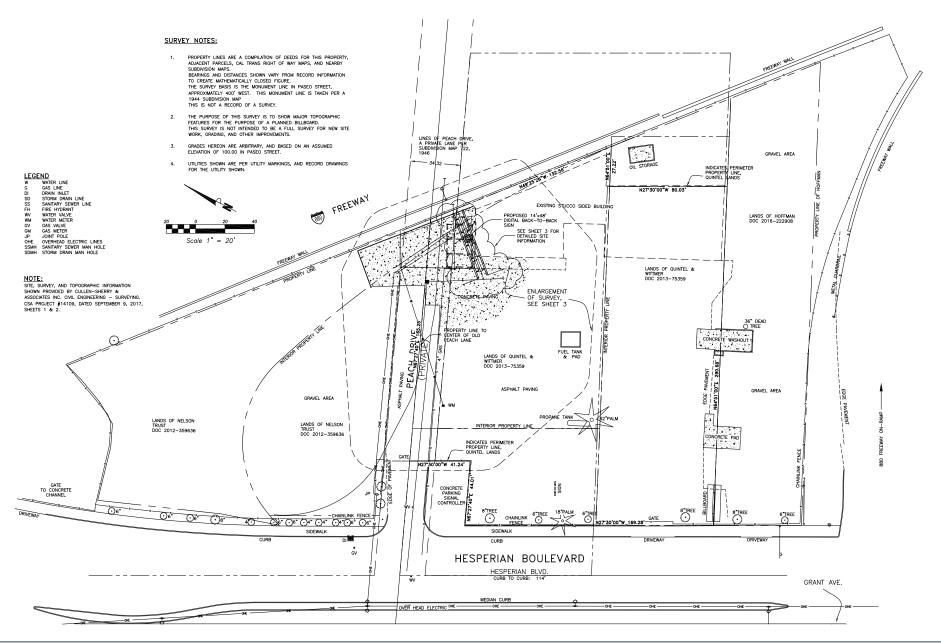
Project Site Plan Source: AMZ Engineering February 2019
